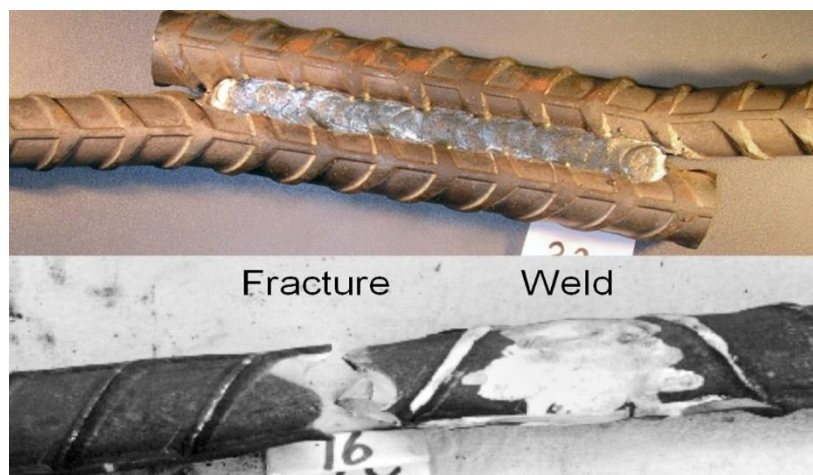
Welded Connection for Reinforcement Bars.
